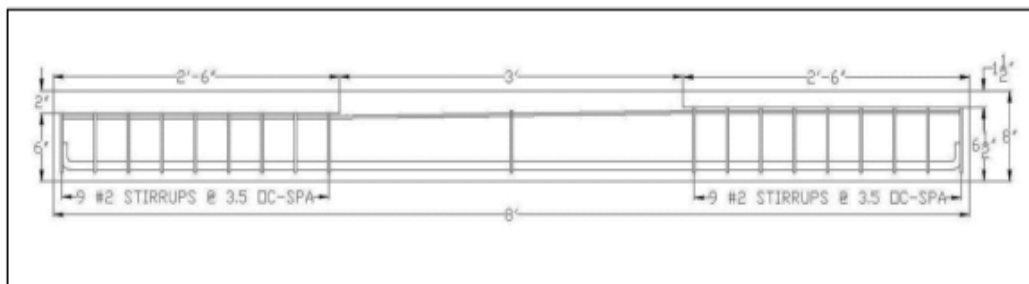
Full Scale Beam Dimensions tested by Klein (2013)
